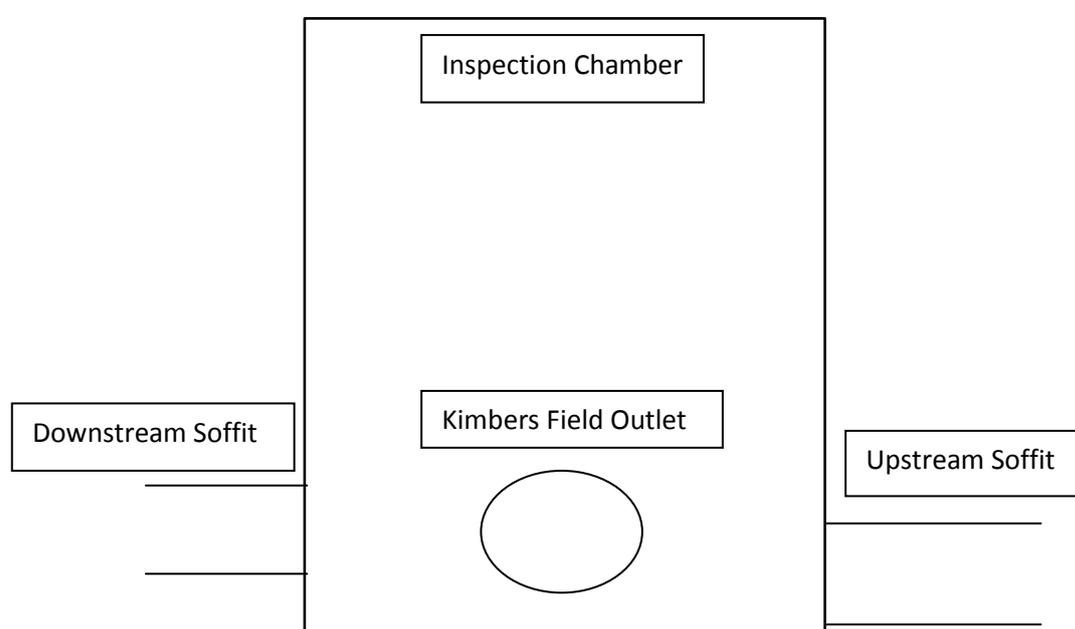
block and line diagram of adjoining 'manhole inspection chamber' from Kimbers Field into Avenell Road
